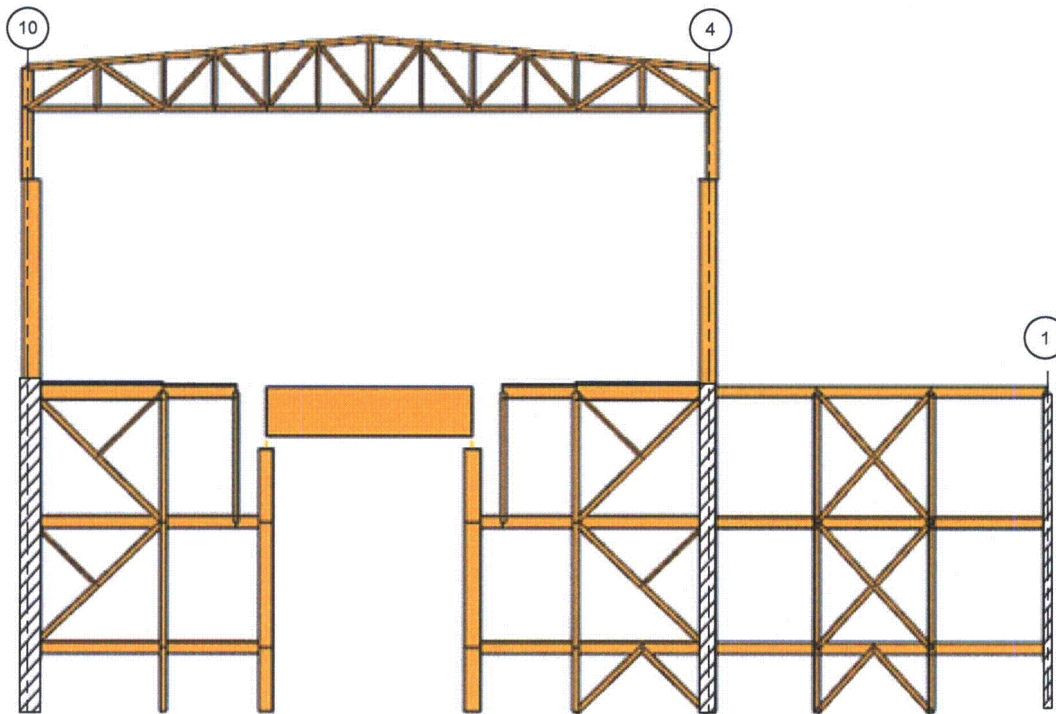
Typical TI Structure Cross Section at Column Line F (Looking East)
